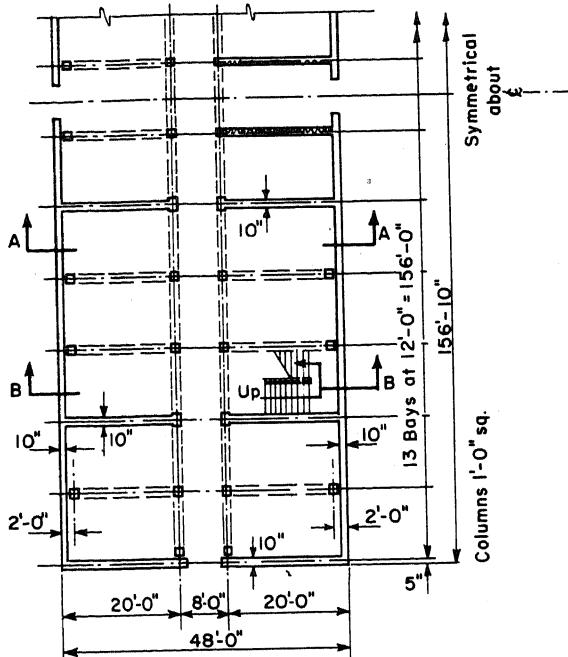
Plan of two-story reinforced concrete shear wall building
